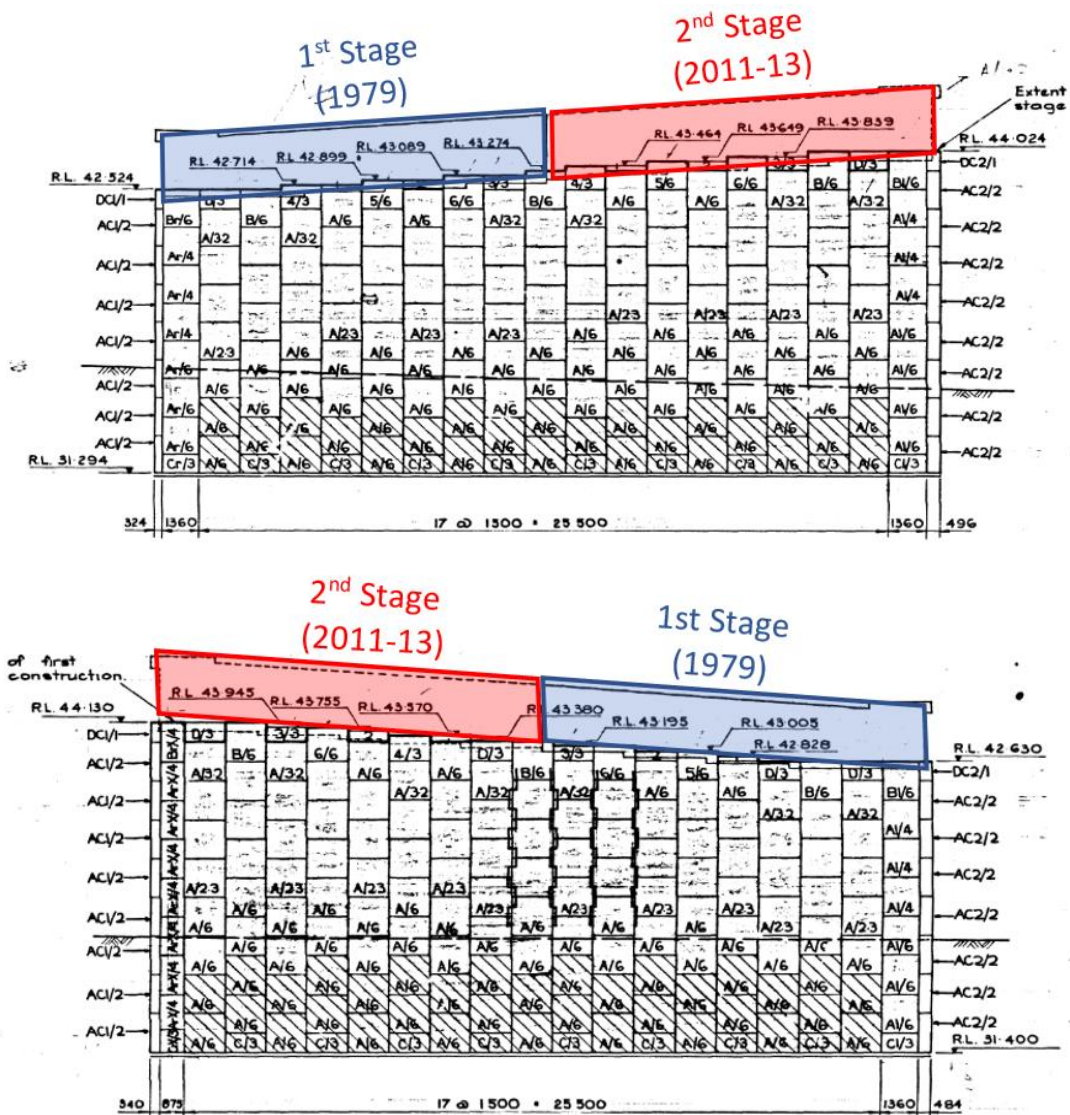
Abutment walls (rear view) - Original 1979 Design drawings
